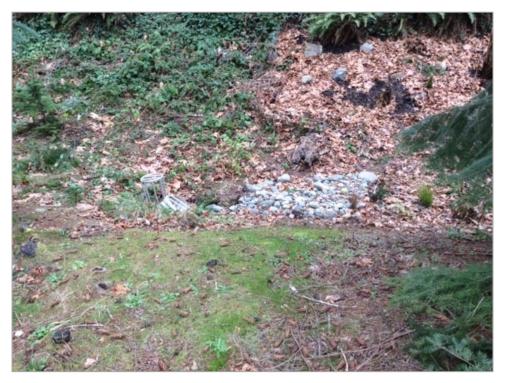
New catch basin and stormwater pipe at 8100 SE 48th Street, which contributes runoff into subject stormwater pipe. Catch basin drains directly downhill through 8101 SE 48th Street to subject.
